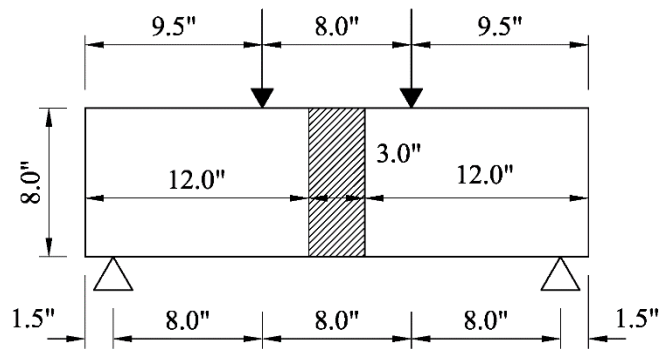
Details of test specimens for ASTM C78 with flat joint
